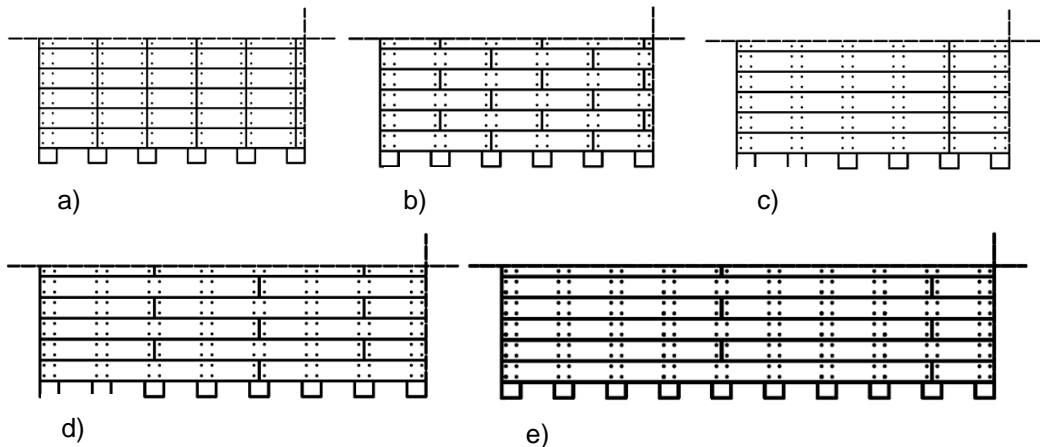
Flooring lay-up: a) single span (0.5 m) boards; b) two span (1m) staggered boards; c) four span (2 m) boards; d) four span staggered boards; e) eight span (4 m) staggered boards (A\_10x5)
